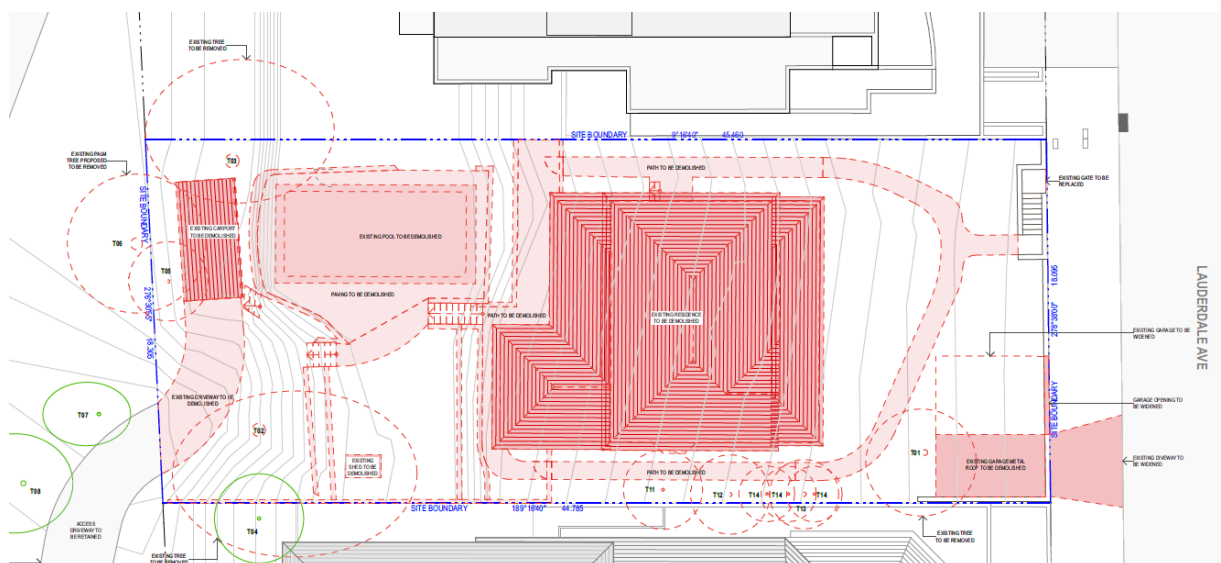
Extract of Demolition Plan (Source: Archer Office)
